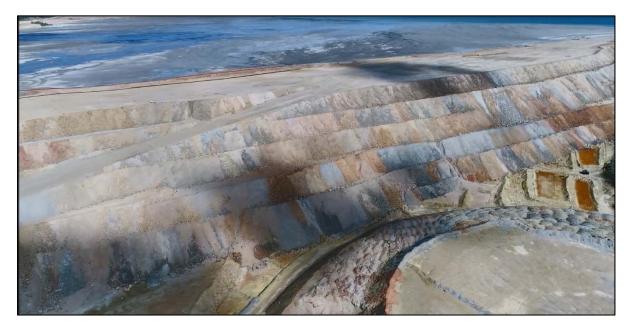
North-South Embankment downstream shell, looking northwest towards the top of the new mine haul ramp at EL. 6,400 ft
